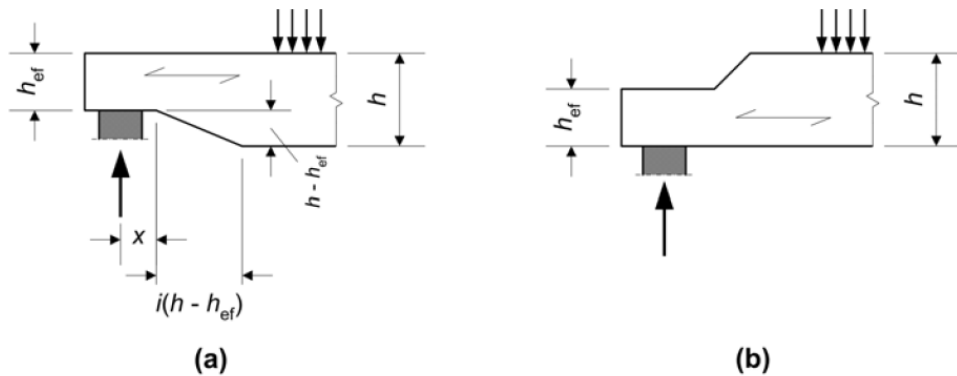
Beams with a notch at the end (NEN-EN 1995-1-1)
